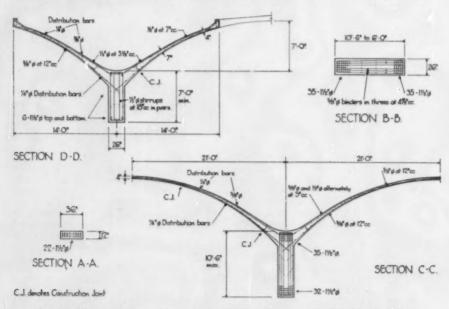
Cross Sections of an Intermediate Frame and Cantilever Slabs.
